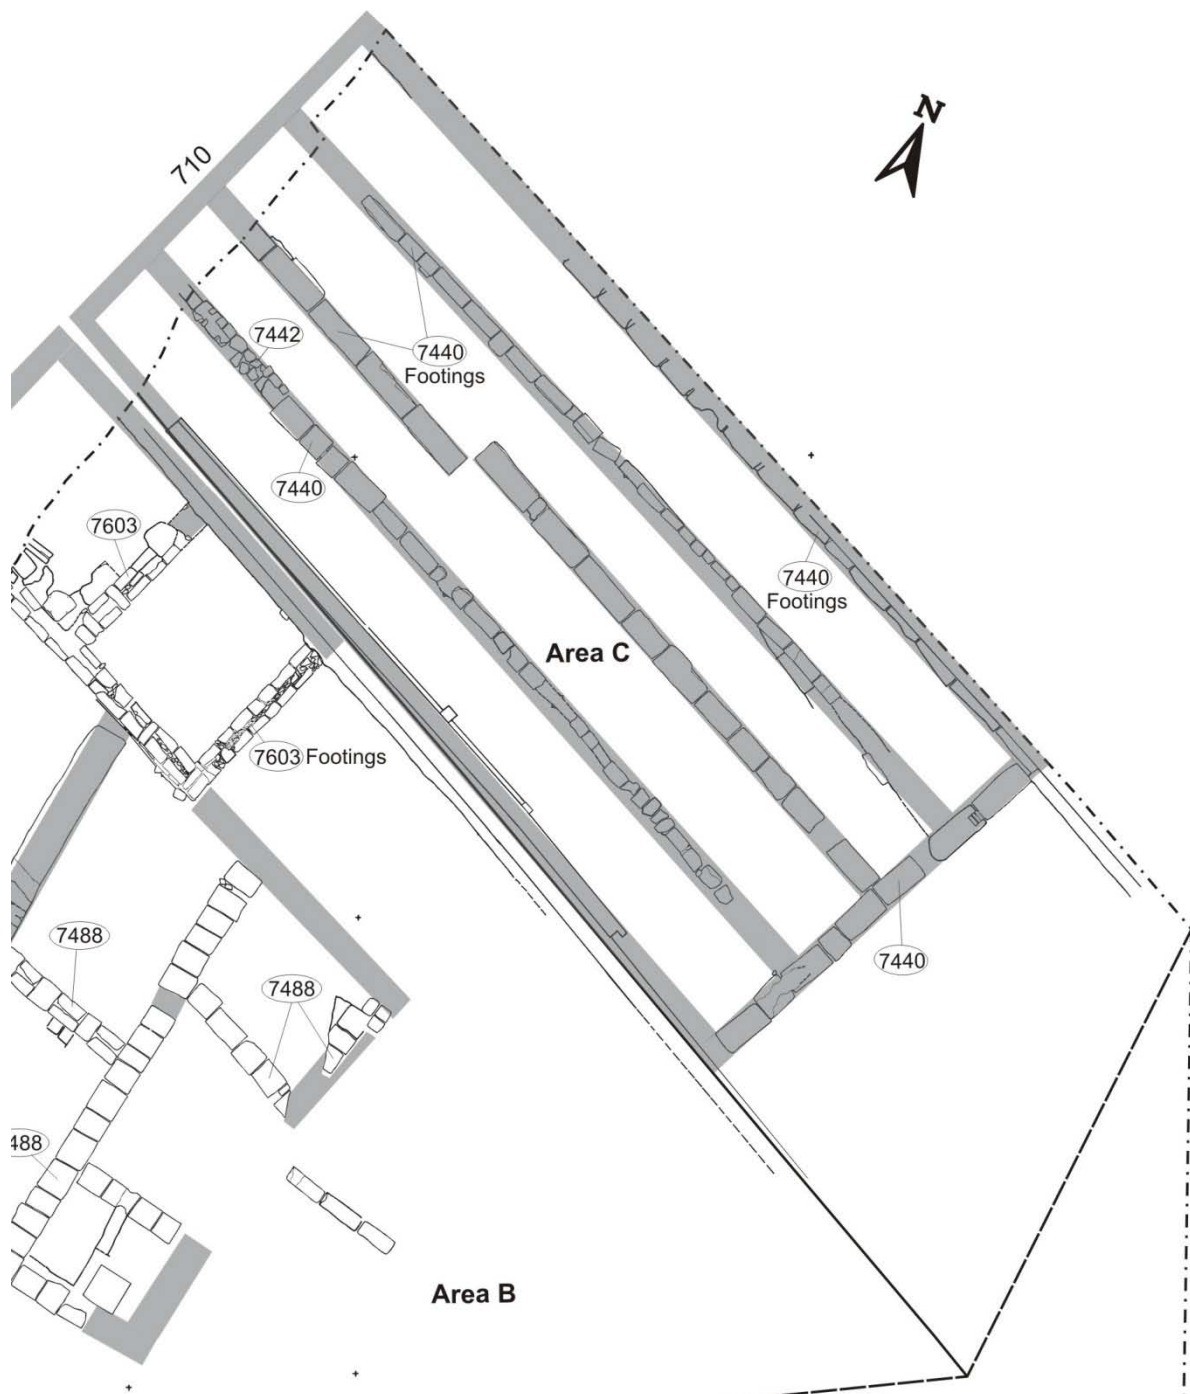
Interpretive plan showing the remains of the 1880s footings in Area C. Projected connections have been suggested with shaded grey areas. (Extract from Plan 22, Section 10).
